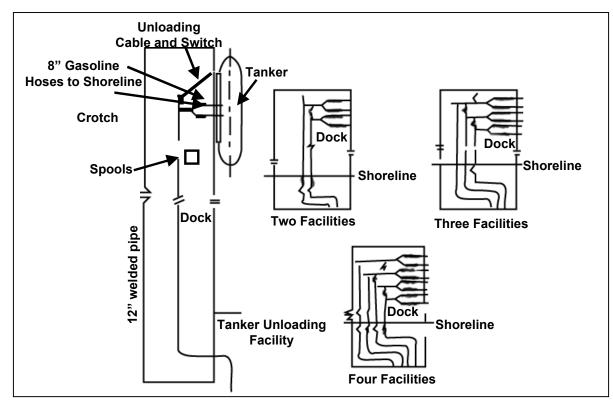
Layout of marine dock facilities for tanker unloading.
